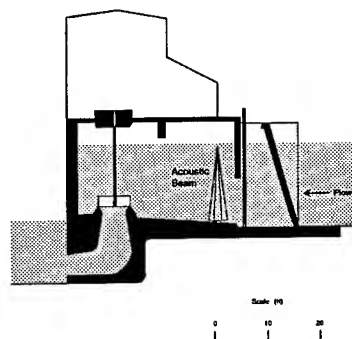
Cross-section of Tower Dam powerhouse showing location of transducer and sample volume.
